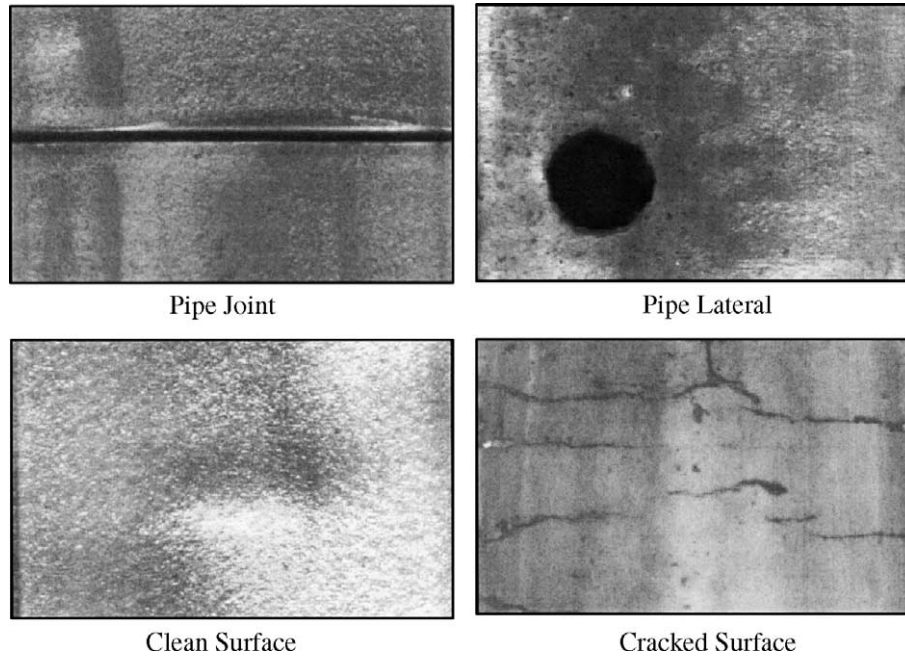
Typical SSET images of underground concrete pipe showing different objects.
